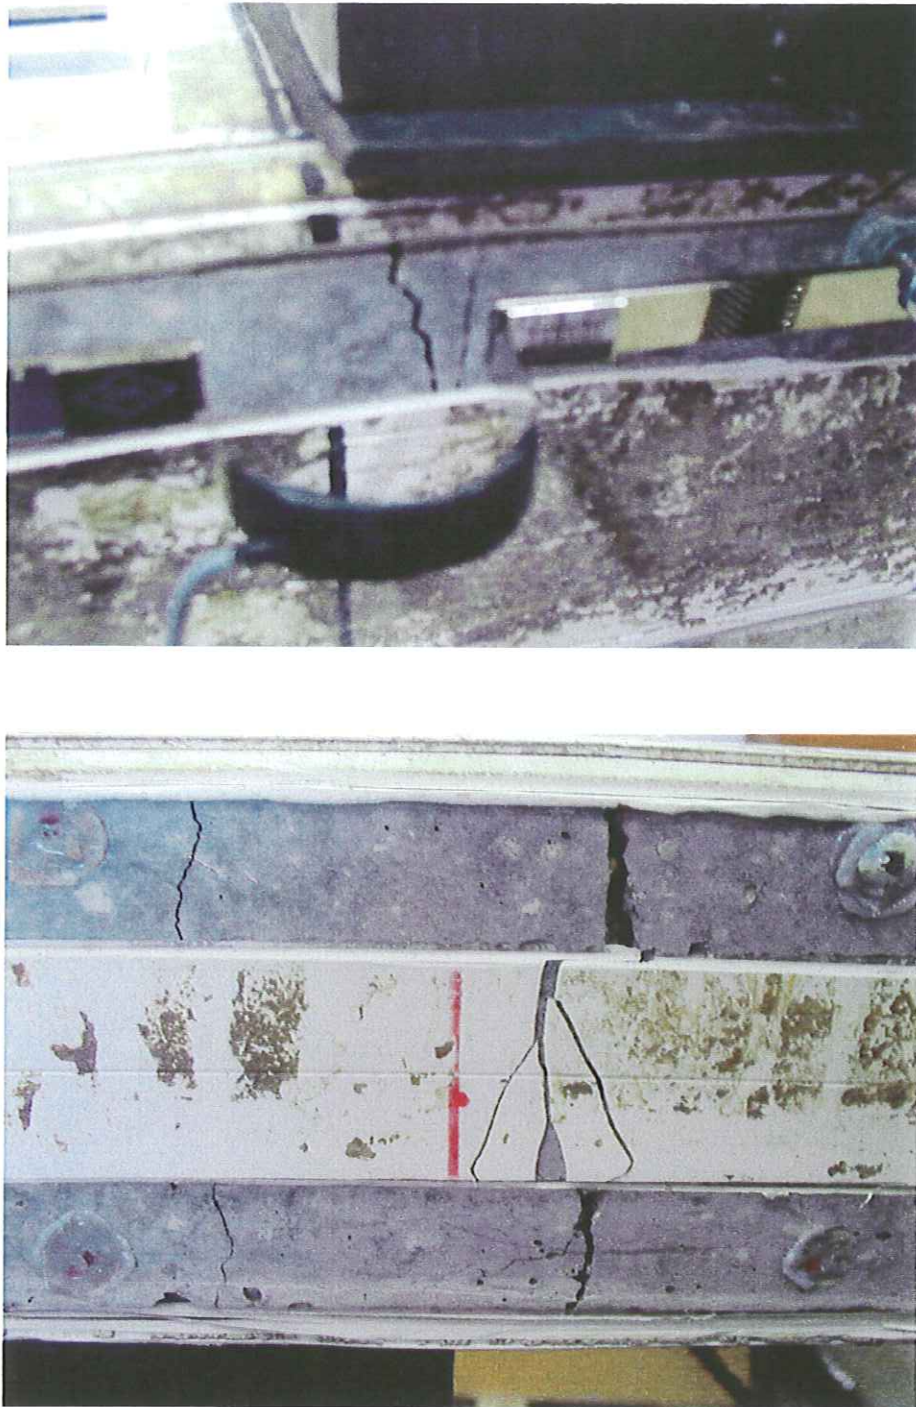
Typical flexural failure of the concrete beams reinforced with steel and covered with PVC panels.
